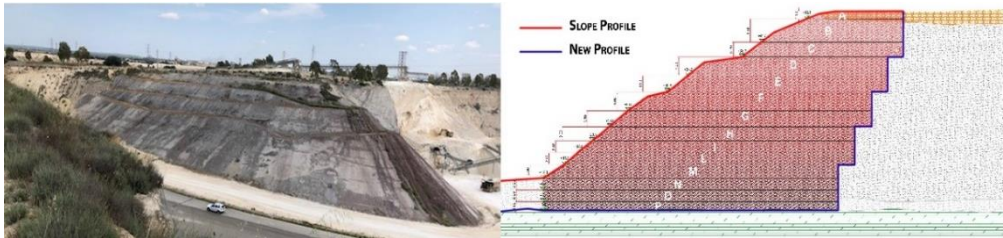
a front view of AREA 2 and a section of design solution: current slope profile and future bulkhead.
